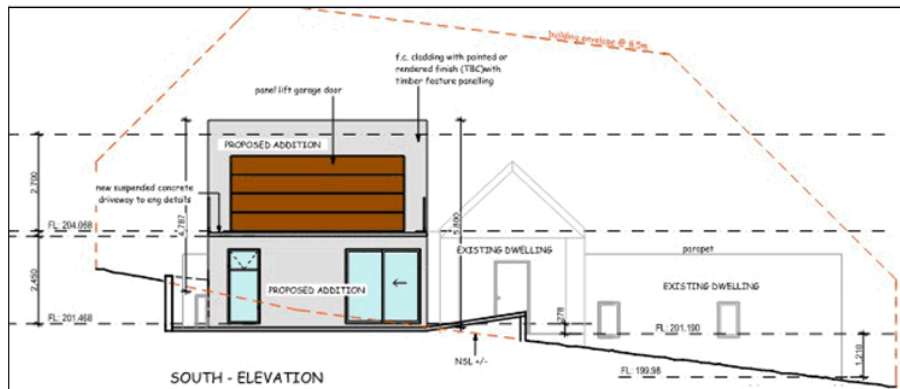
Southern (front) elevation (note the plan does not include the embankment - road level is approximately level with roller door) (DuoDesigns, 2020)
